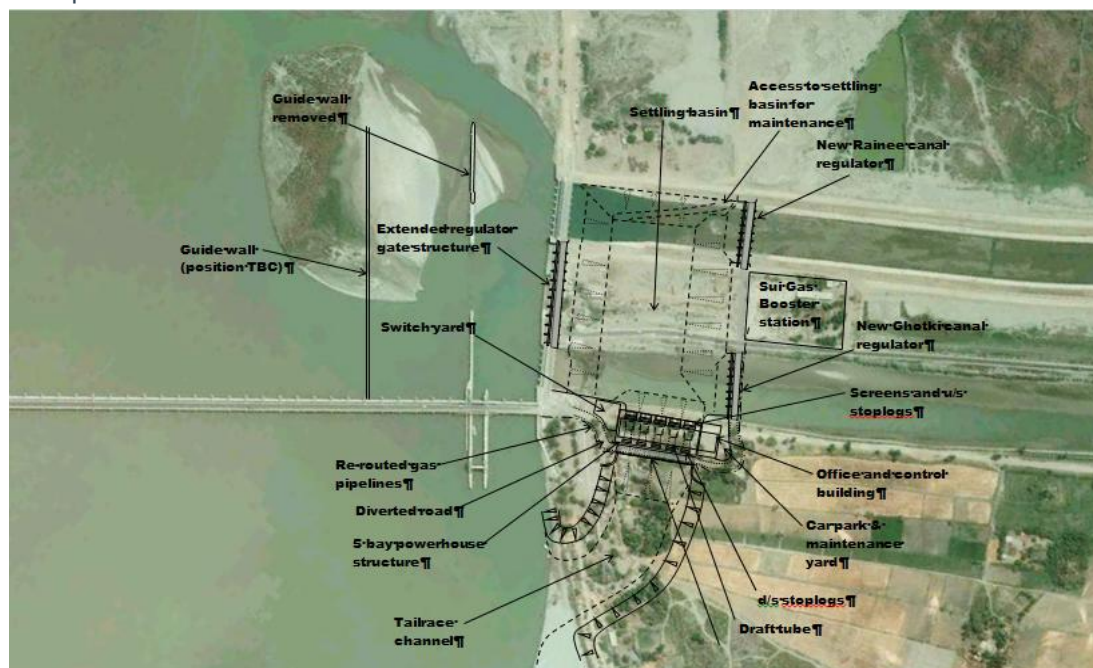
Guddu Barrage left bank proposals (Ref 3)
